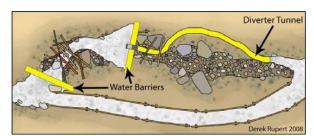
To keep the construction site dry, the water barriers will redirect water into the diversion channel and diversion channel.
